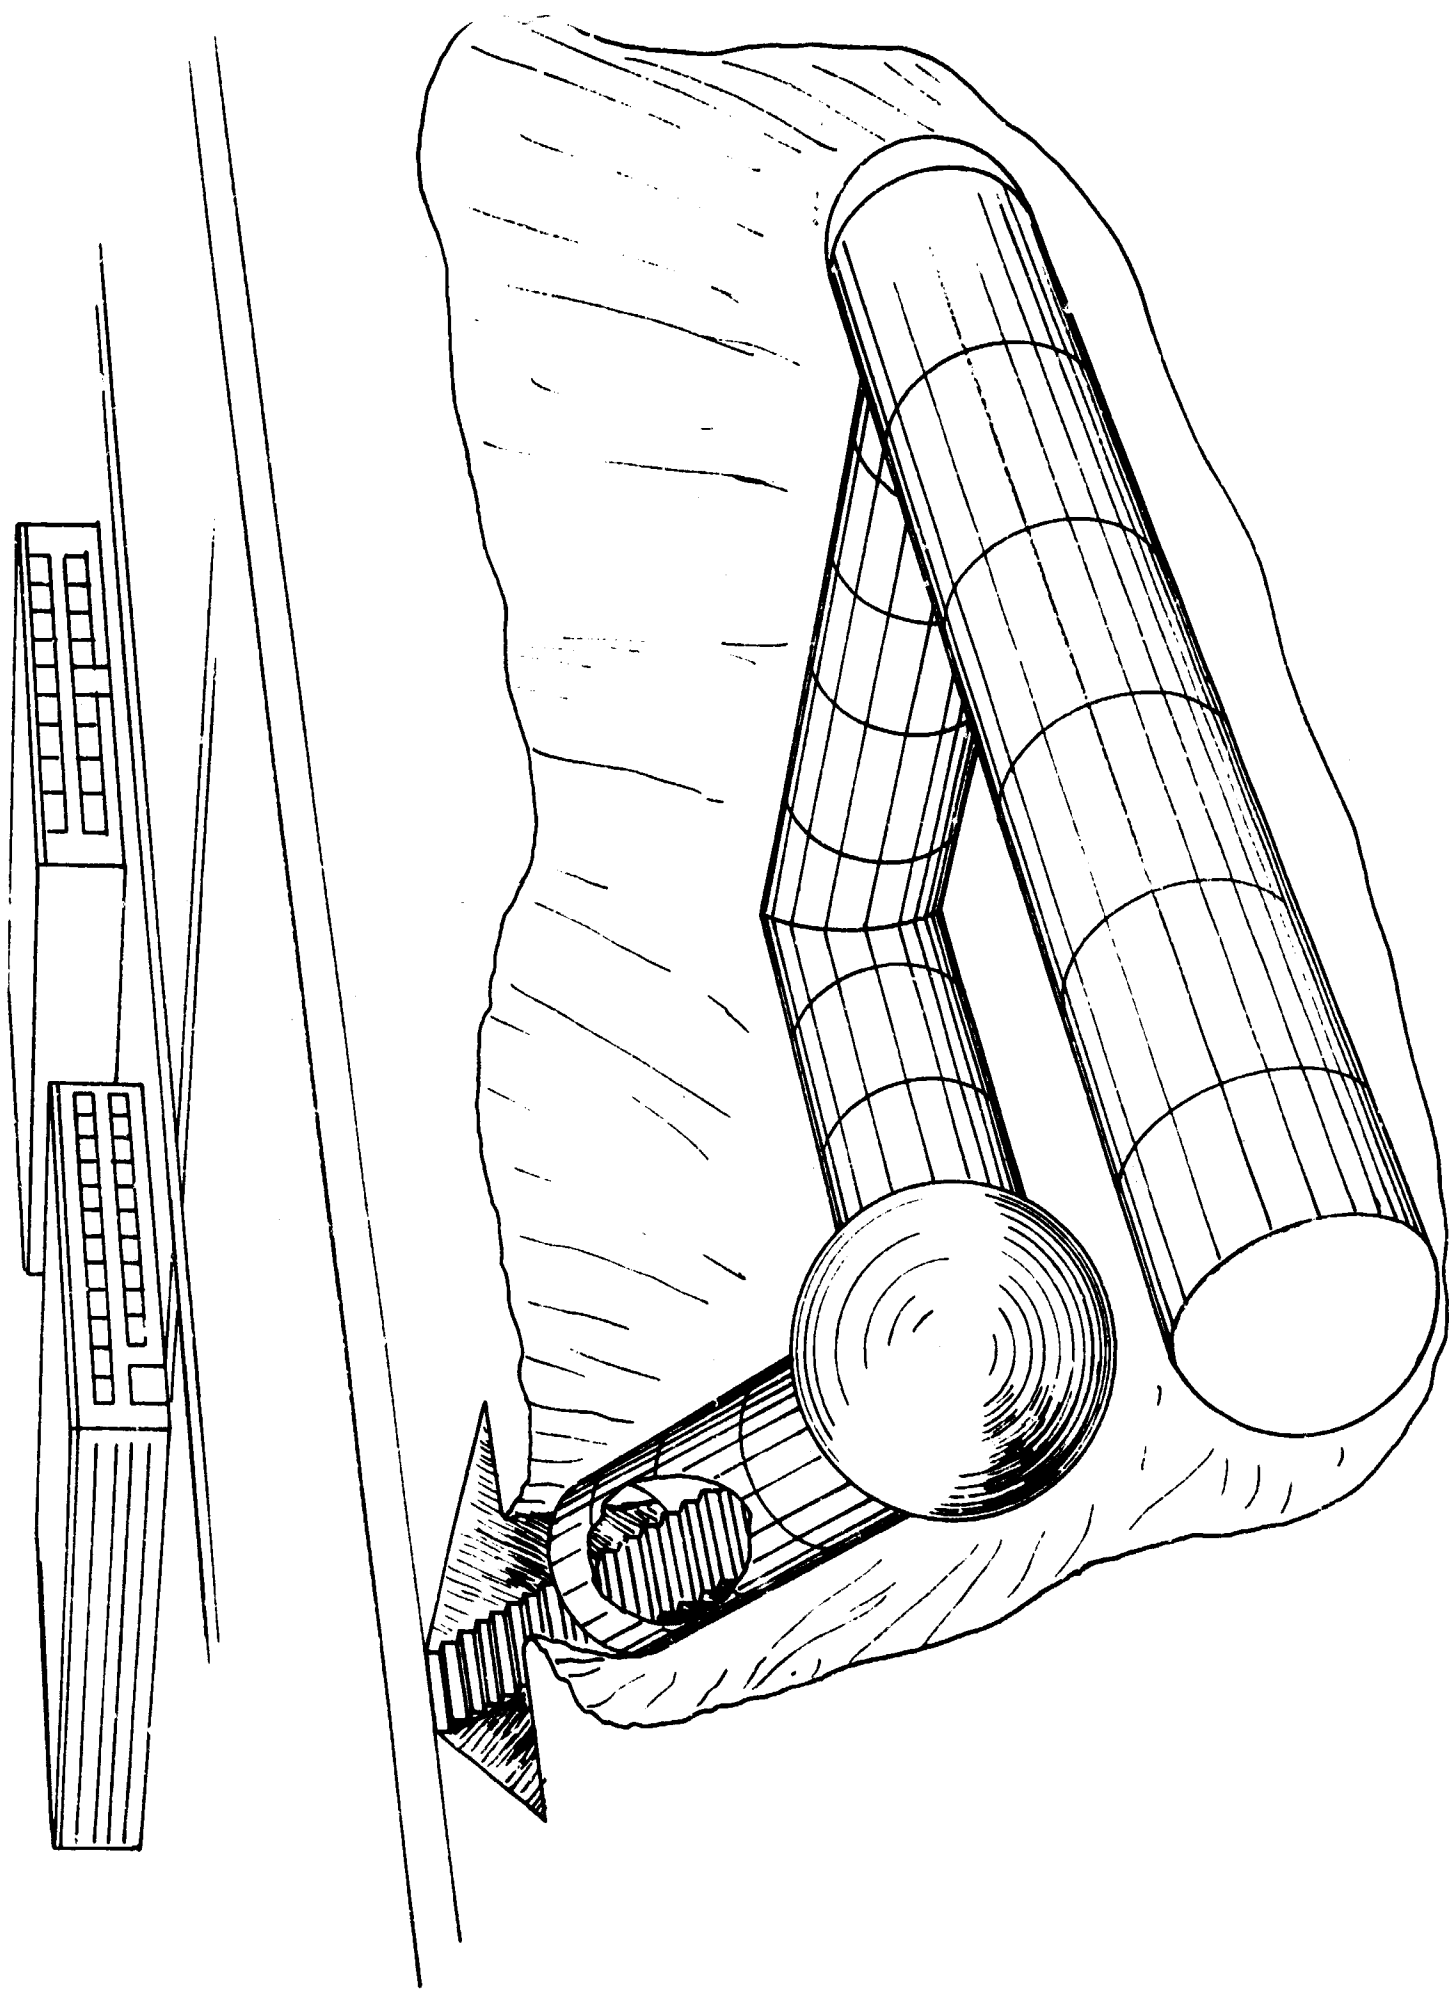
ENTRANCEWAY CONFIGURATION WITH COMPRESSION SPHERE BLAST SECTION
